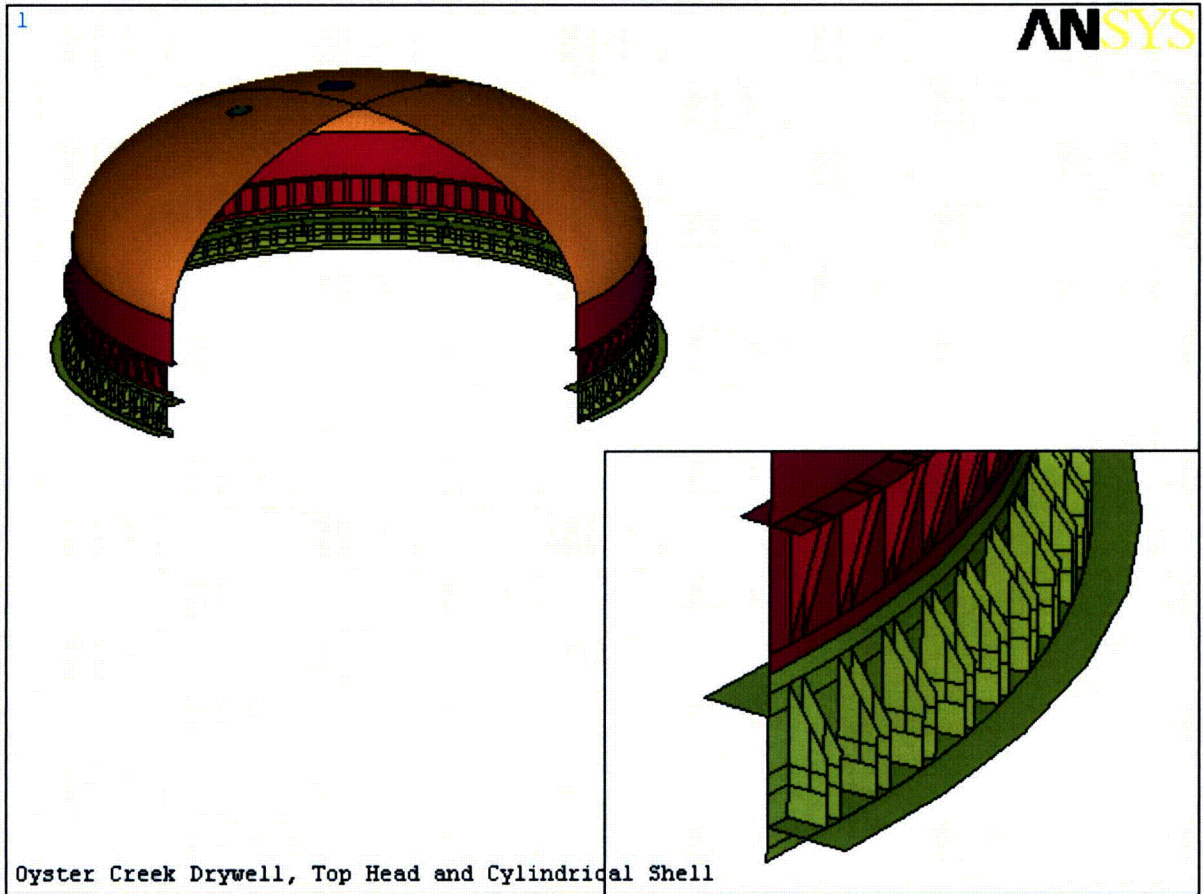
Elliptical Dome, Top Flange and Bottom Flange Assembly
